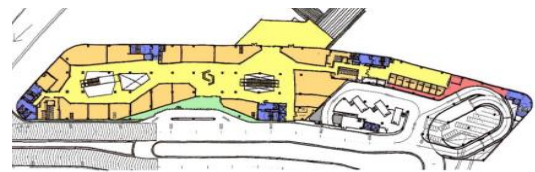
The second floor level of Penang Sentral that connects commuters to the ferry departure gate (redrawn based on actual building plan)
